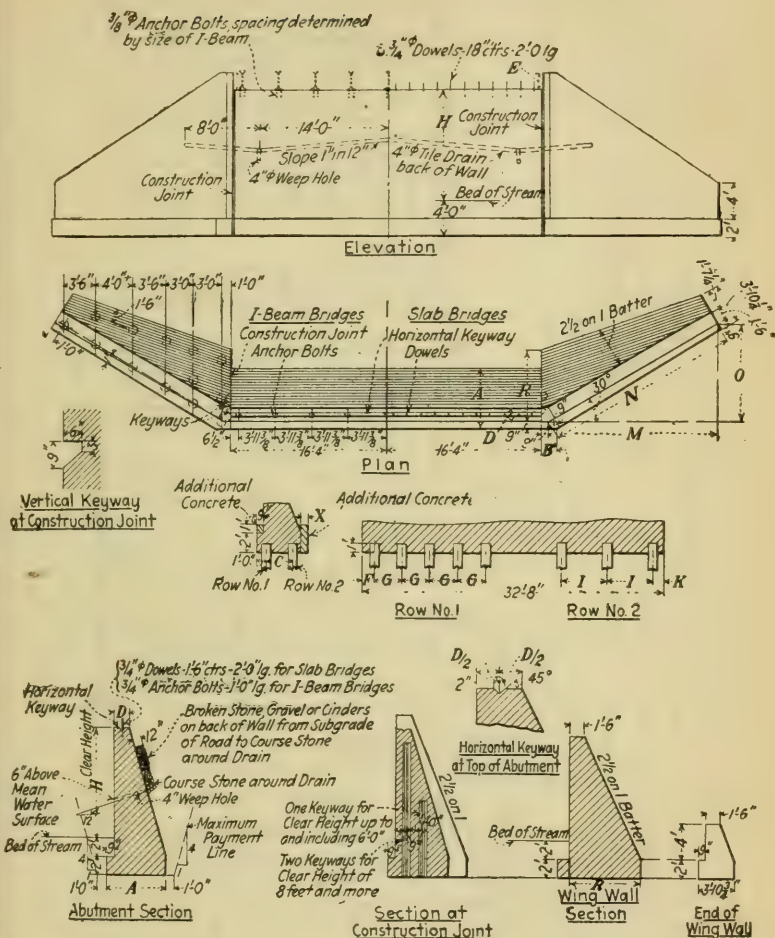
B*.—Standard abutments slab bridges. New York State
